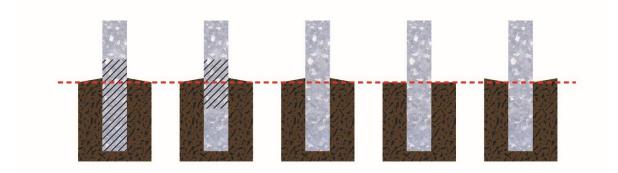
Showing the best design (left) to worst design (right) for galvanized steel embedded in soil.
